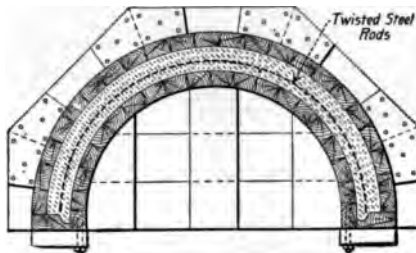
Arch Form for Sewer at Beverly, Mass.
